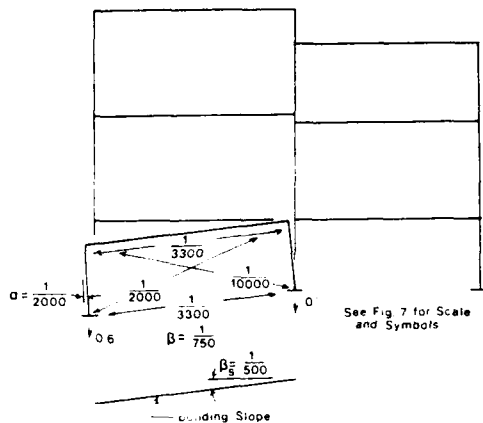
Building Distortions for Tunnel Face at Sta. 308+50
